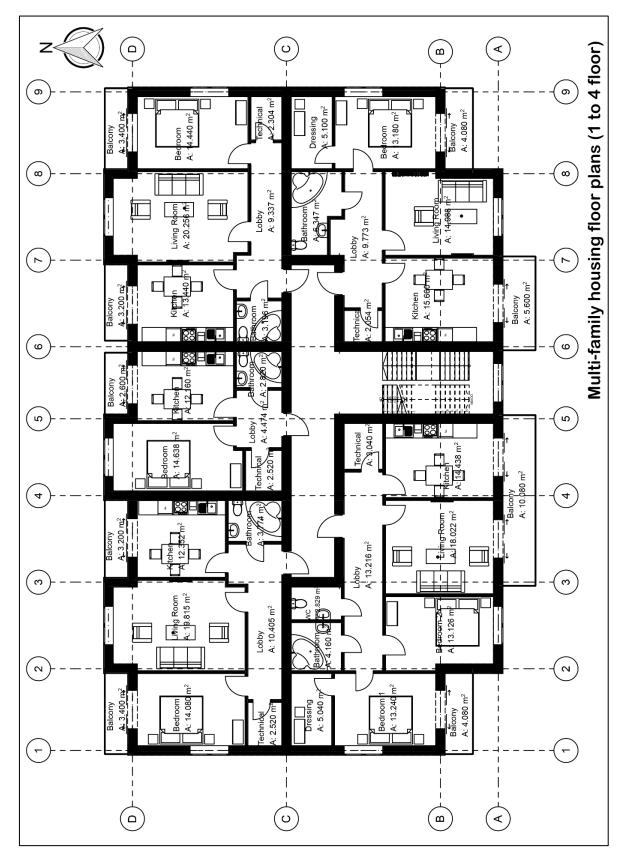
Detailed floor plan – 1st to 4th floor. Source: (By Author)
